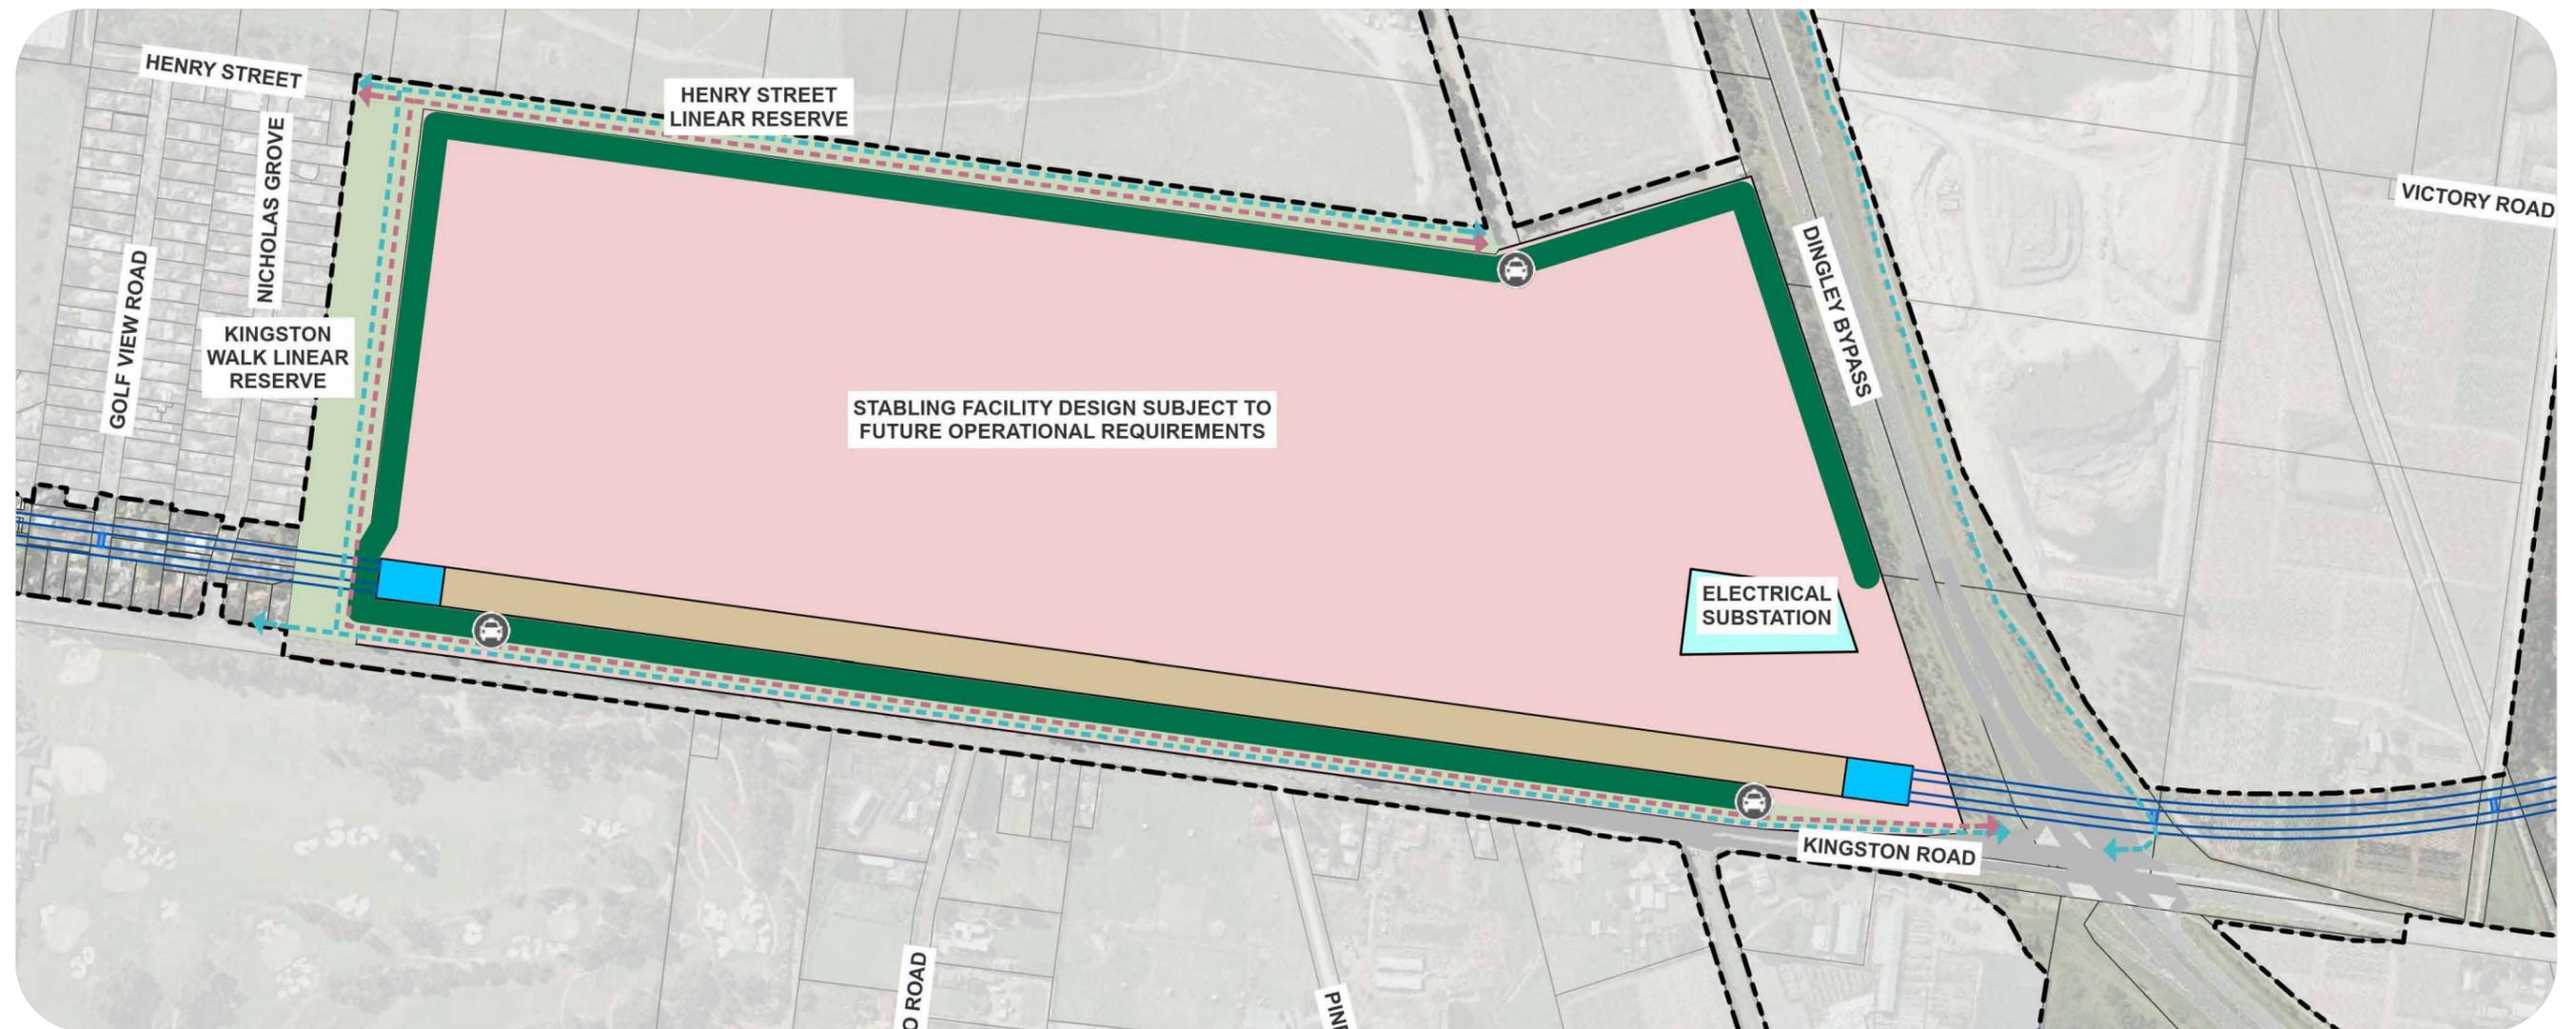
Excerpt from approved SRL Station and Tunnel Plans showing location of the Stabling network support facility within context of the future stabling facility at Heatherton
